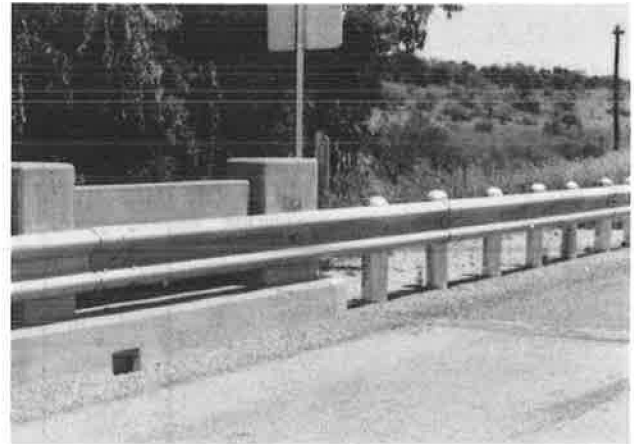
Example of good practice for the transition from approach guardrail to bridge barrier.
